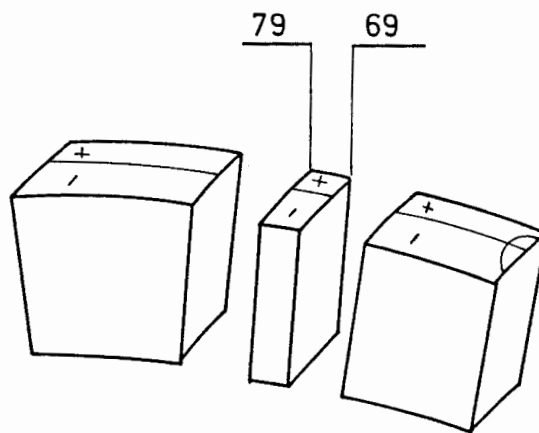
CUTTING SCHEME OF SPECIMEN N° 1
